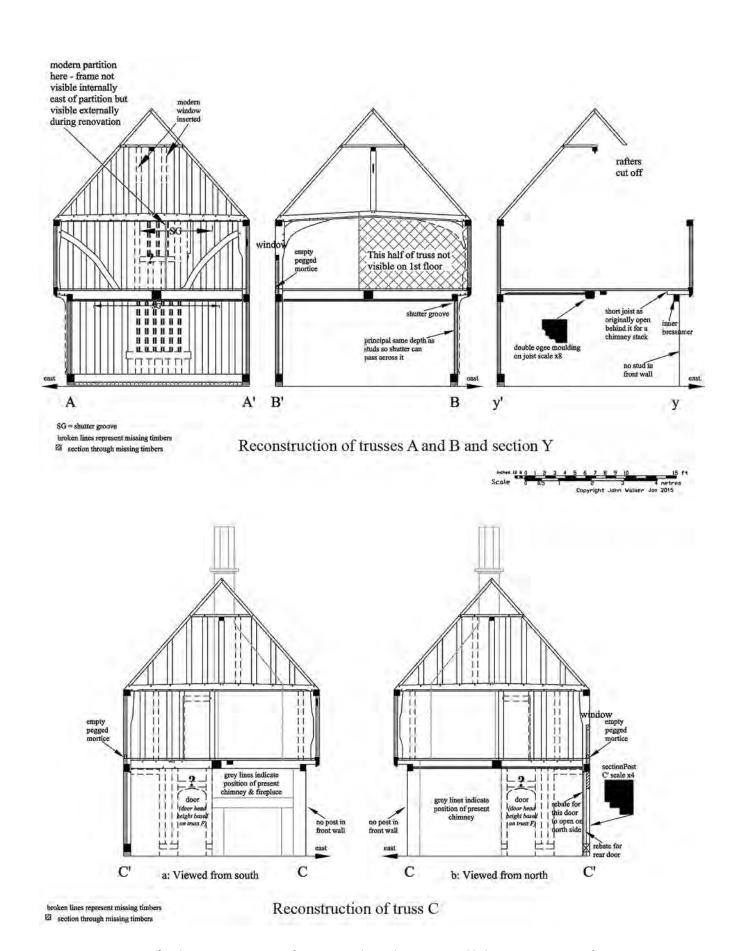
Above, reconstruction of trusses A and B and section y; and below, reconstruction of Truss C
